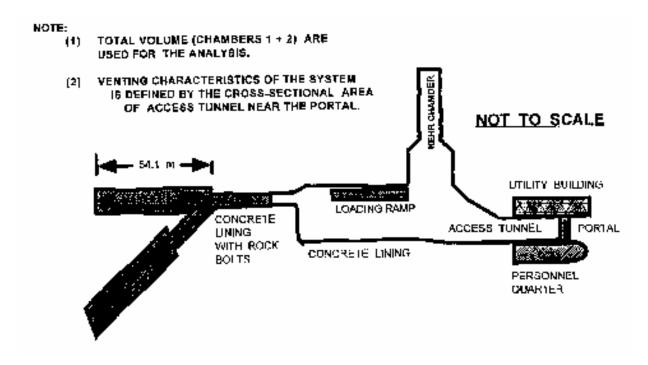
Plan View of the Steingletscher Underground Munitions Storage Facility.
